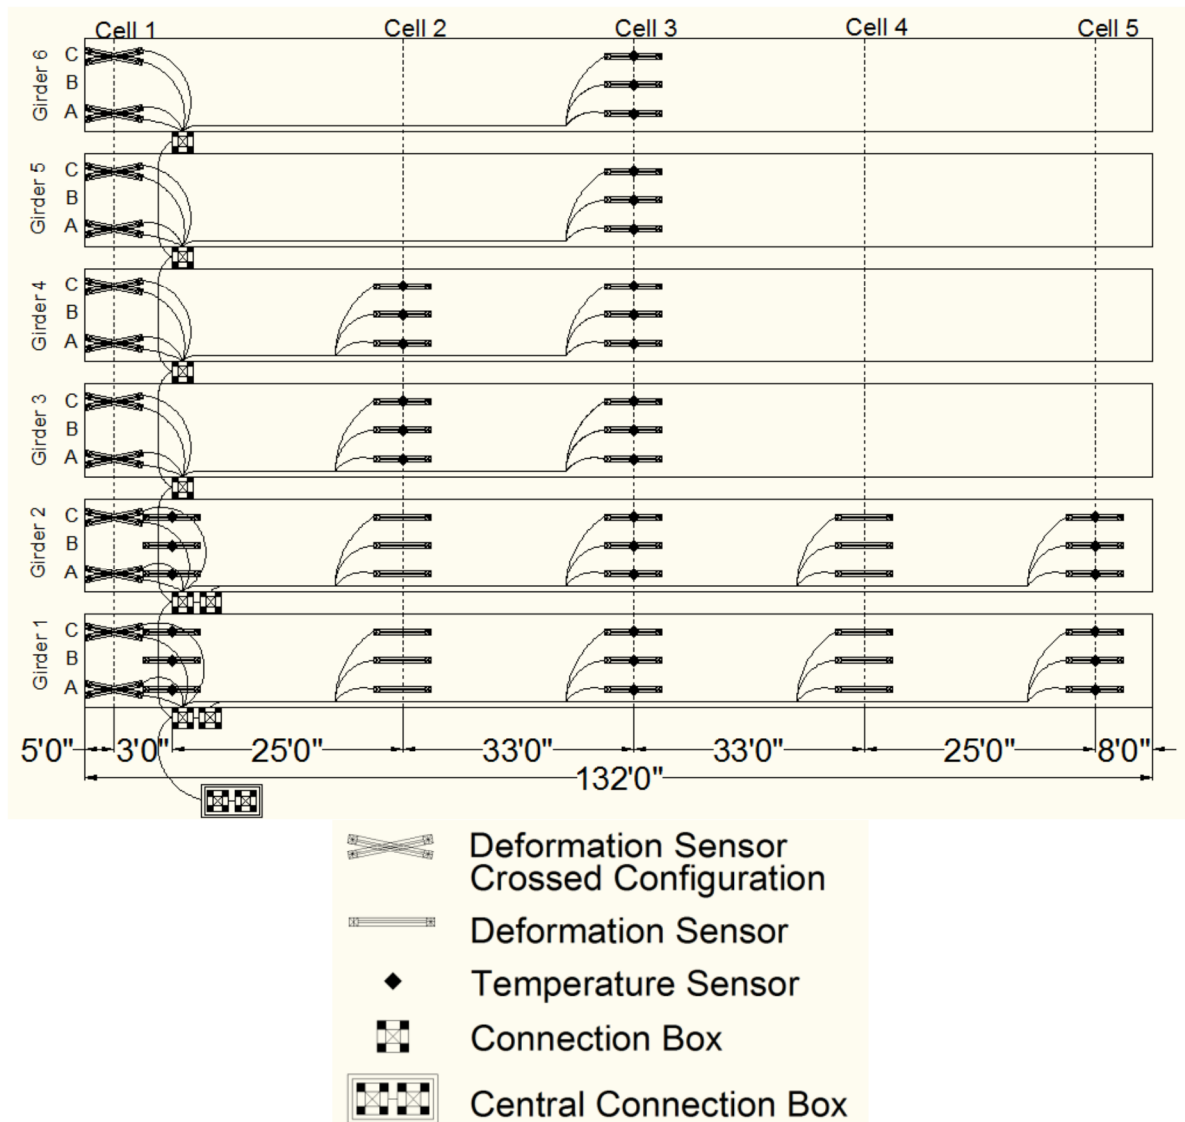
Bridge 9266 – Span 5 sensor plan view [Idriss and Tercero (2009)].
